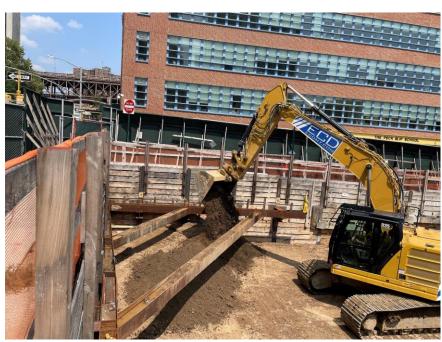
ECD using imported general fill to create a temporary ramp in the northeastern corner of the site (facing east)
